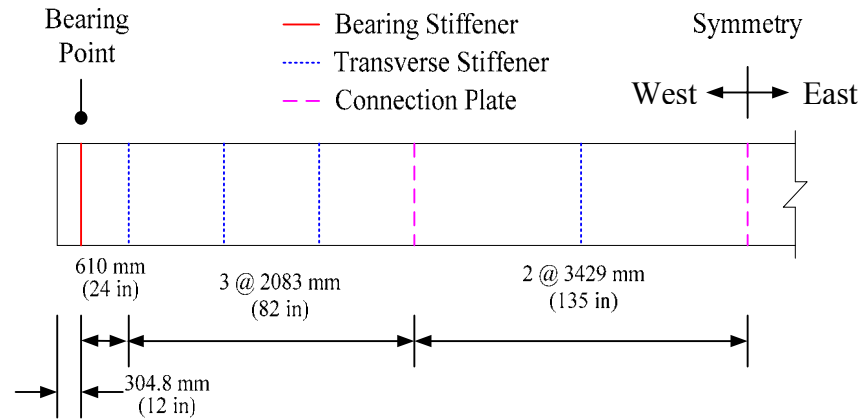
G2 – location layout for bearing stiffeners, transverse stiffeners and connection plates.
